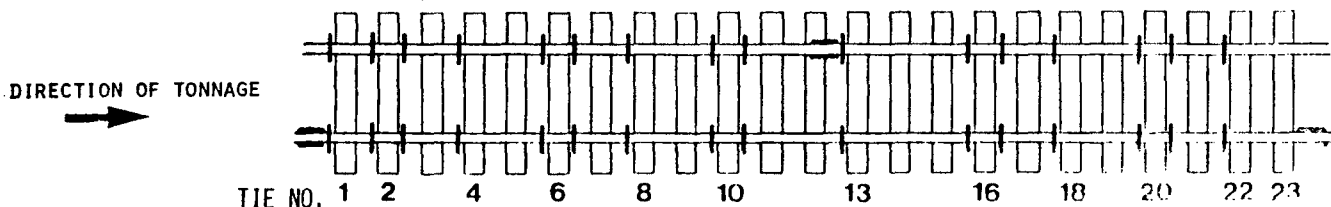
RAIL ANCHOR SPACING FOR 39'
